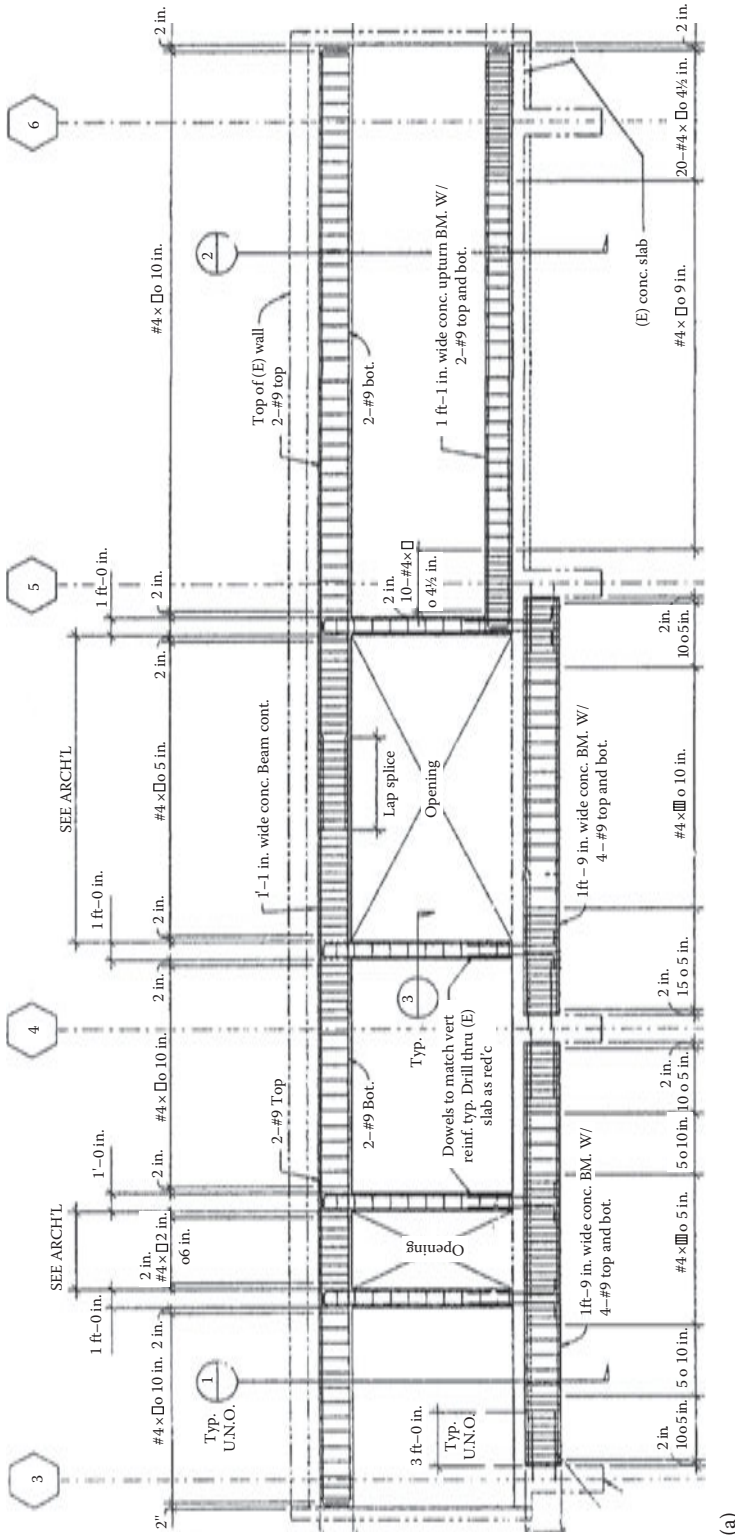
(N) openings in an (E) 3-story concrete shear wall building. The seismic upgrade consisted of providing concrete overlay to restore shear capacity of walls and adding boundary elements around (N) openings: (a) wall elevation. *(Continued)
